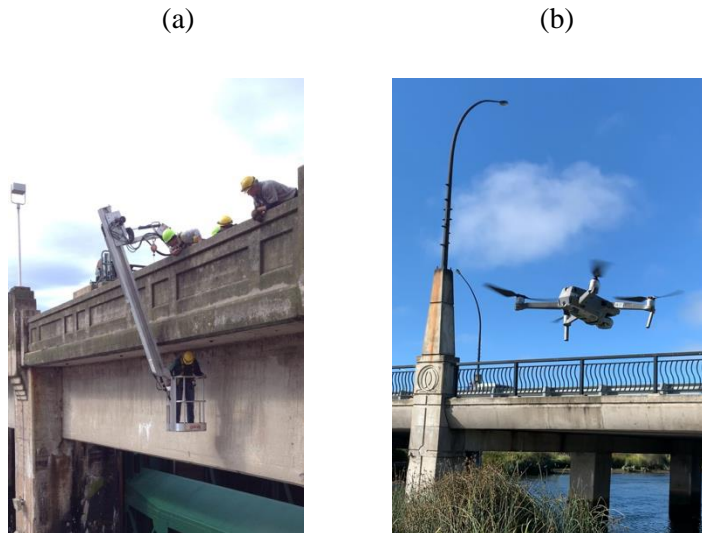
(a) Traditional bridge inspection with accessing difficulties by [1]; (b) Drone-aided inspection on the Anzac Drive Bridge
